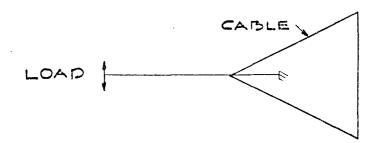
DEFINITION SKETCH FOR SIGN SUPPORT STRUCTURE: LOADS NORMAL TO PLANE OF SIGN PANEL
